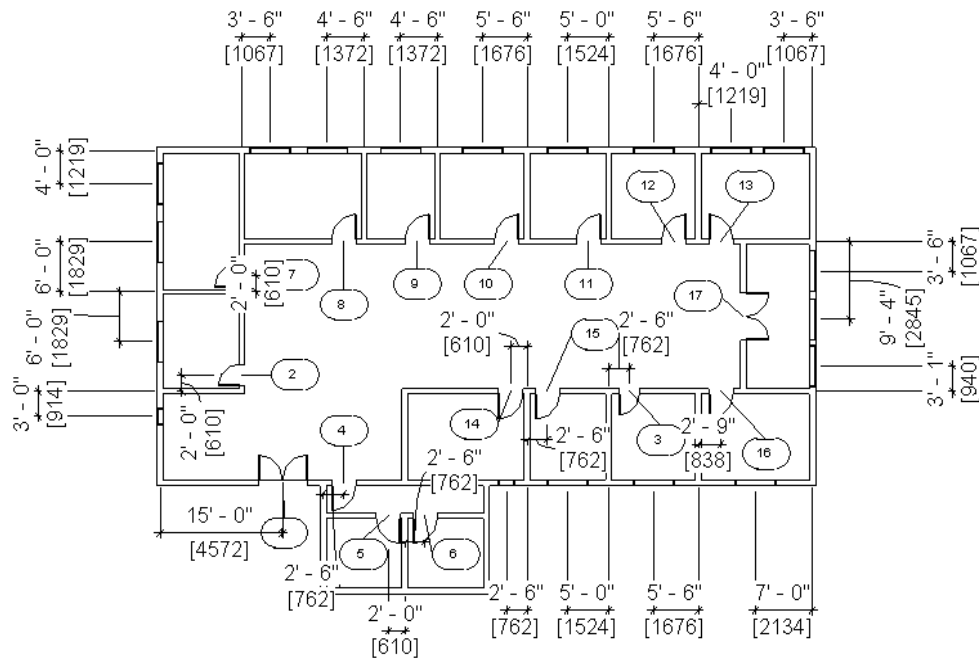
Sketch for adding doors and windows to the Office Building project
